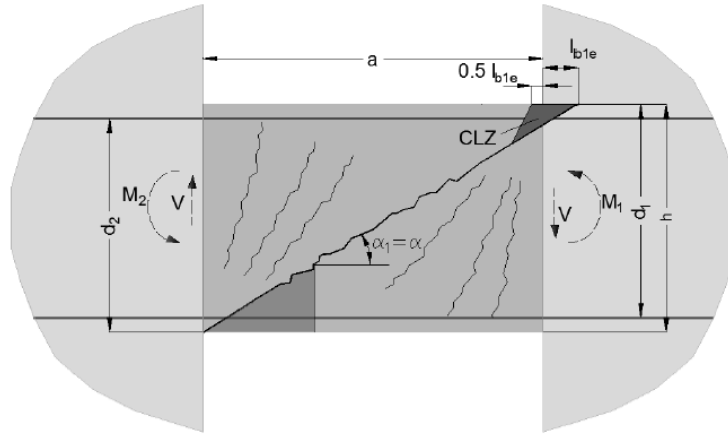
Geometry of the coupling beam (Franssen, 2016)
